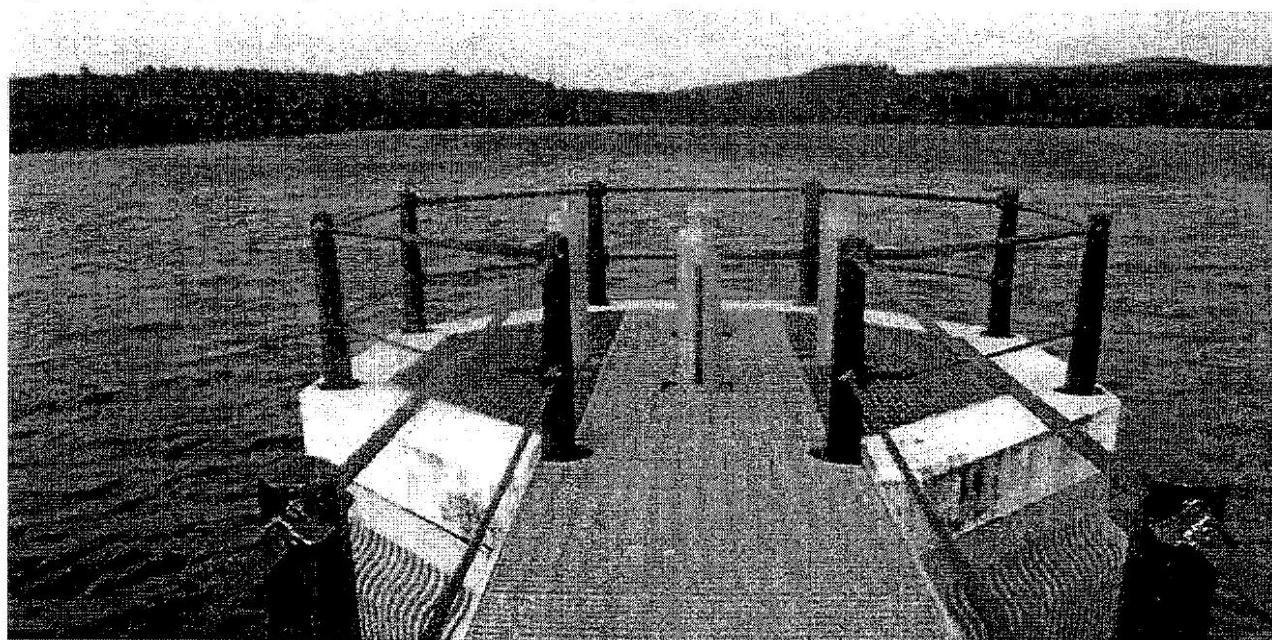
Woodburn, Carrickfergus– Valve tower platform without superstructure – note that at Camlough the central headstocks will not be required
